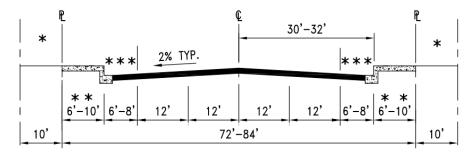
Existing Typical Section for Secondary Arterial (Residential Street)
